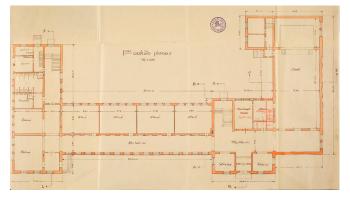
First floor plan of 10-class primary school building in Pasvalys (civ. eng. Povilas Viliūnas, 1937) [drawing from LCVA].
